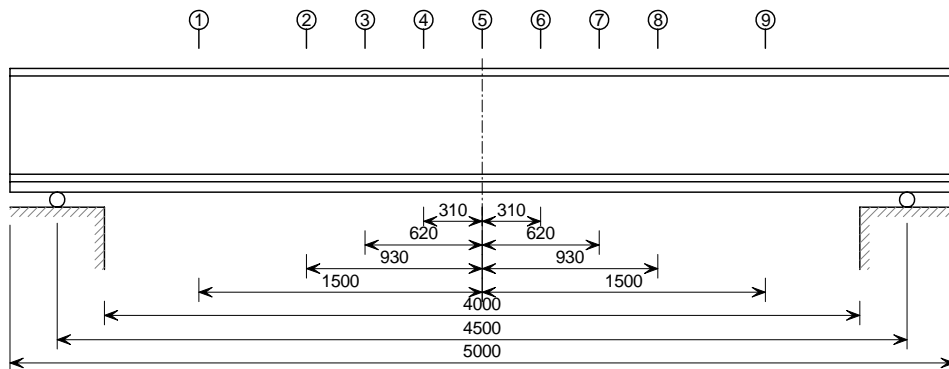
Longitudinal arrangement – Position of thermocouple cross sections
